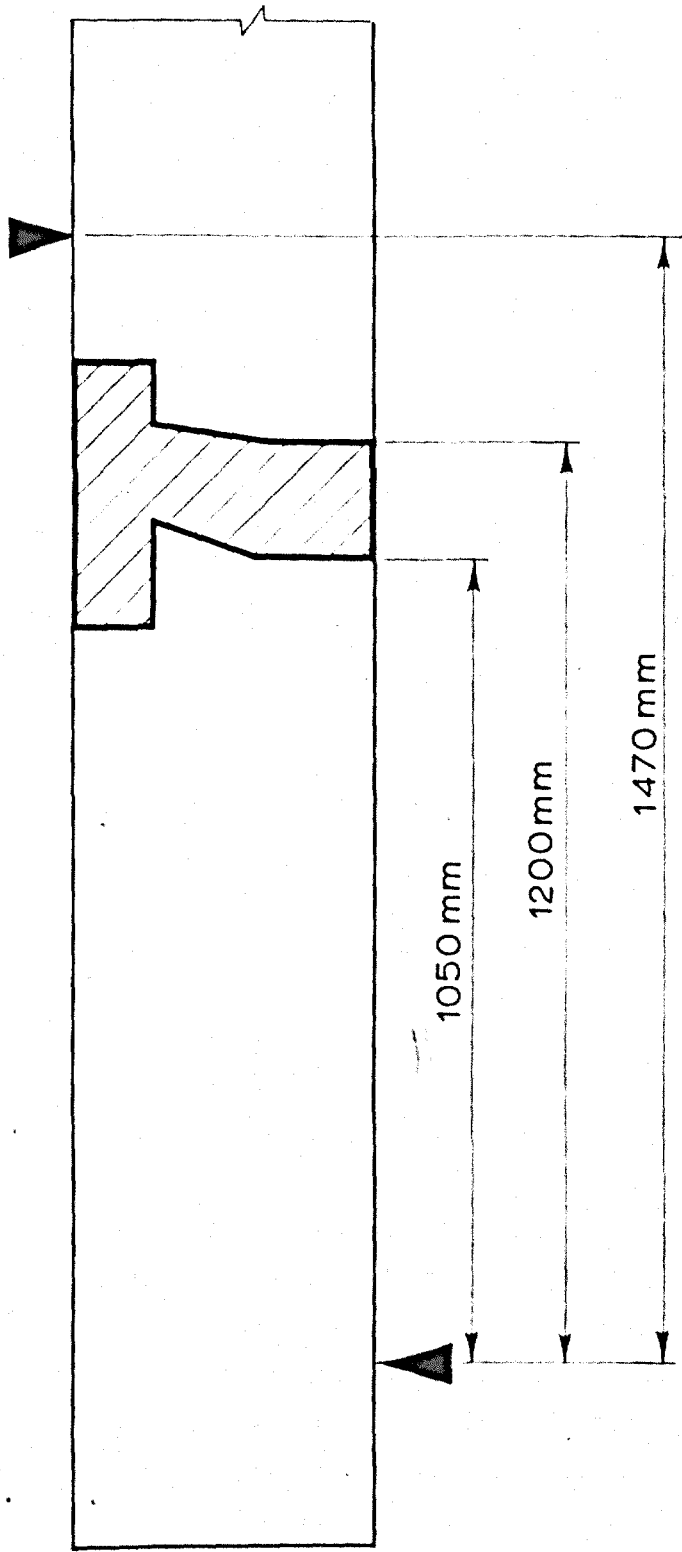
CONCRETE CANTILEVER IN BEAM 9 USED IN FINITE ELEMENT ANALYSIS
